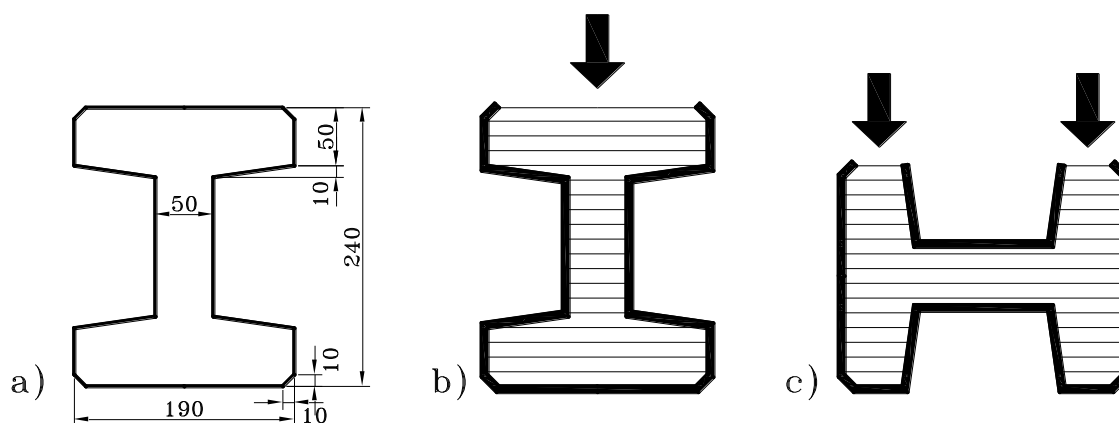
The beam cross section: a) dimensions, b) casting in I-position, c) casting in H-position
